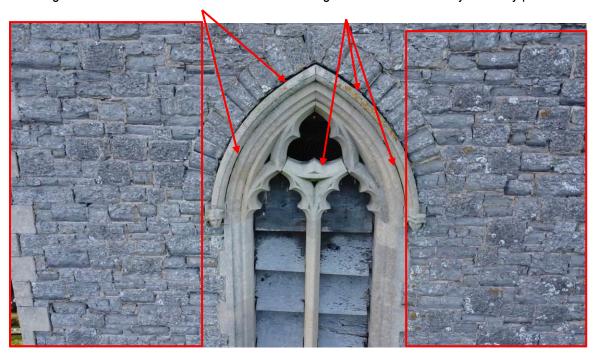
DJI_0245 Widespread Open Joints & Voids Throughout North Elevation Belfry Level
